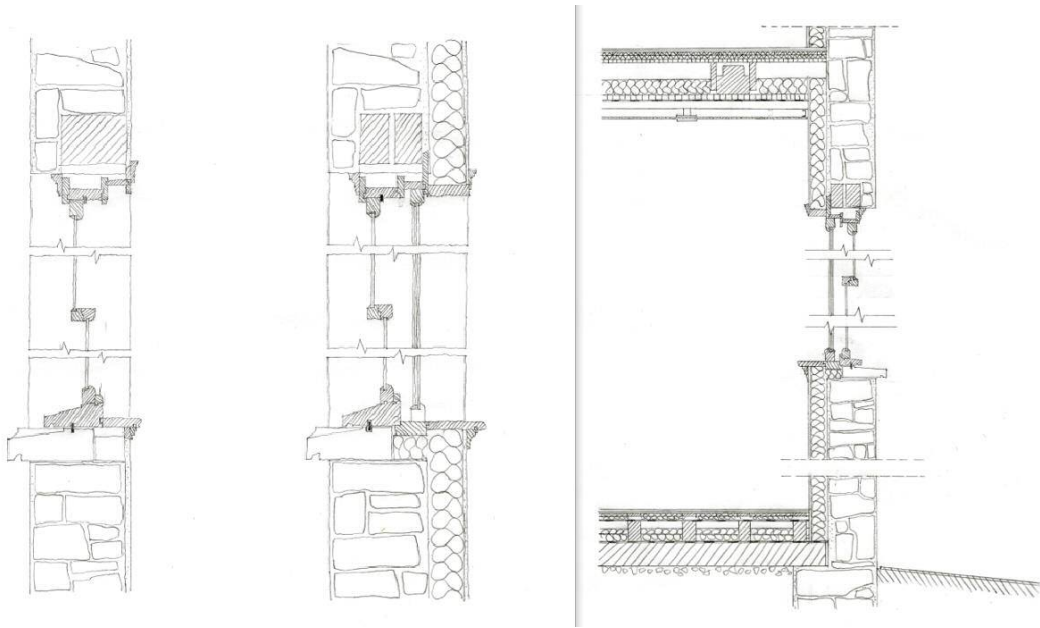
Detailed sketch for secondary glazing, wall insulation and ground insulation
